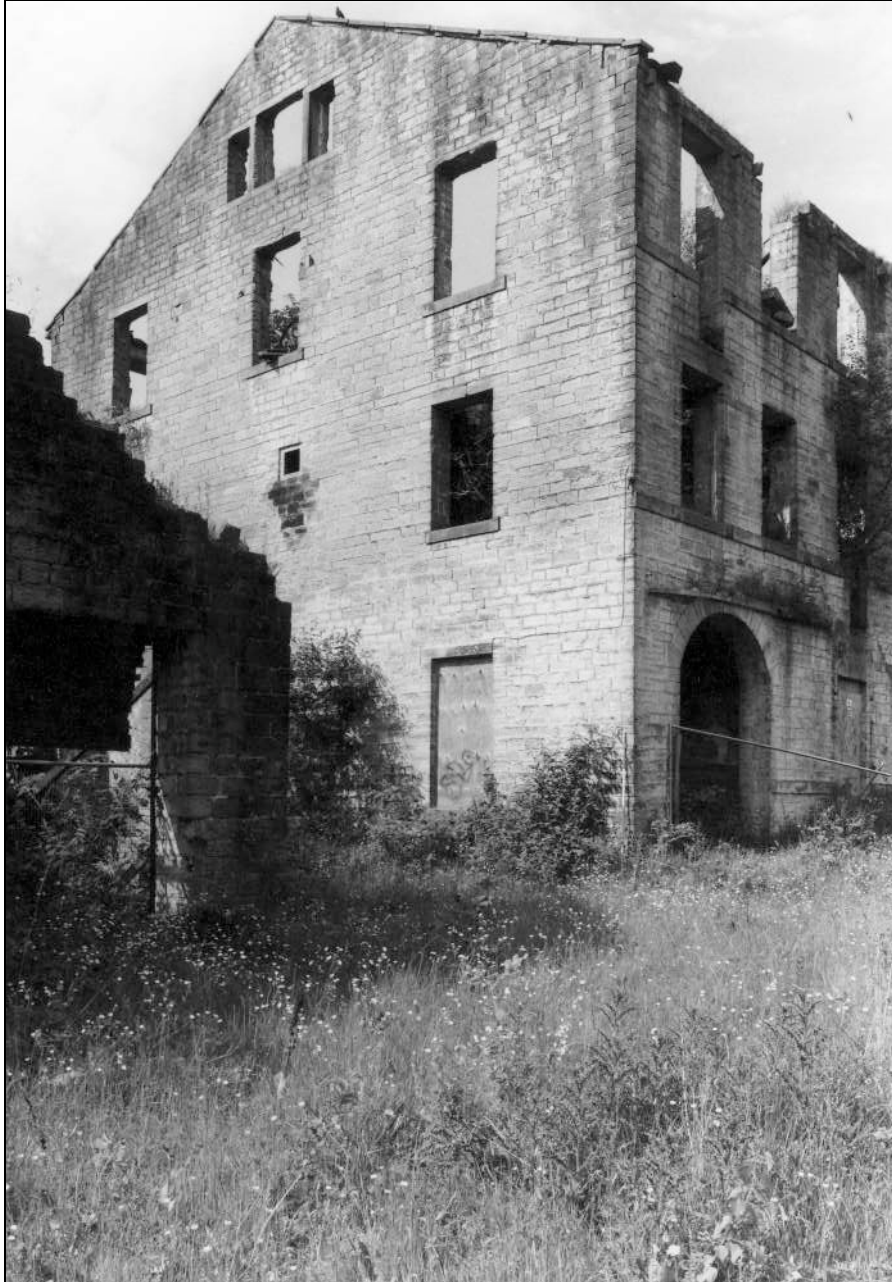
Spinning mill: east gable, from the north-east (film 1, frame 18)
